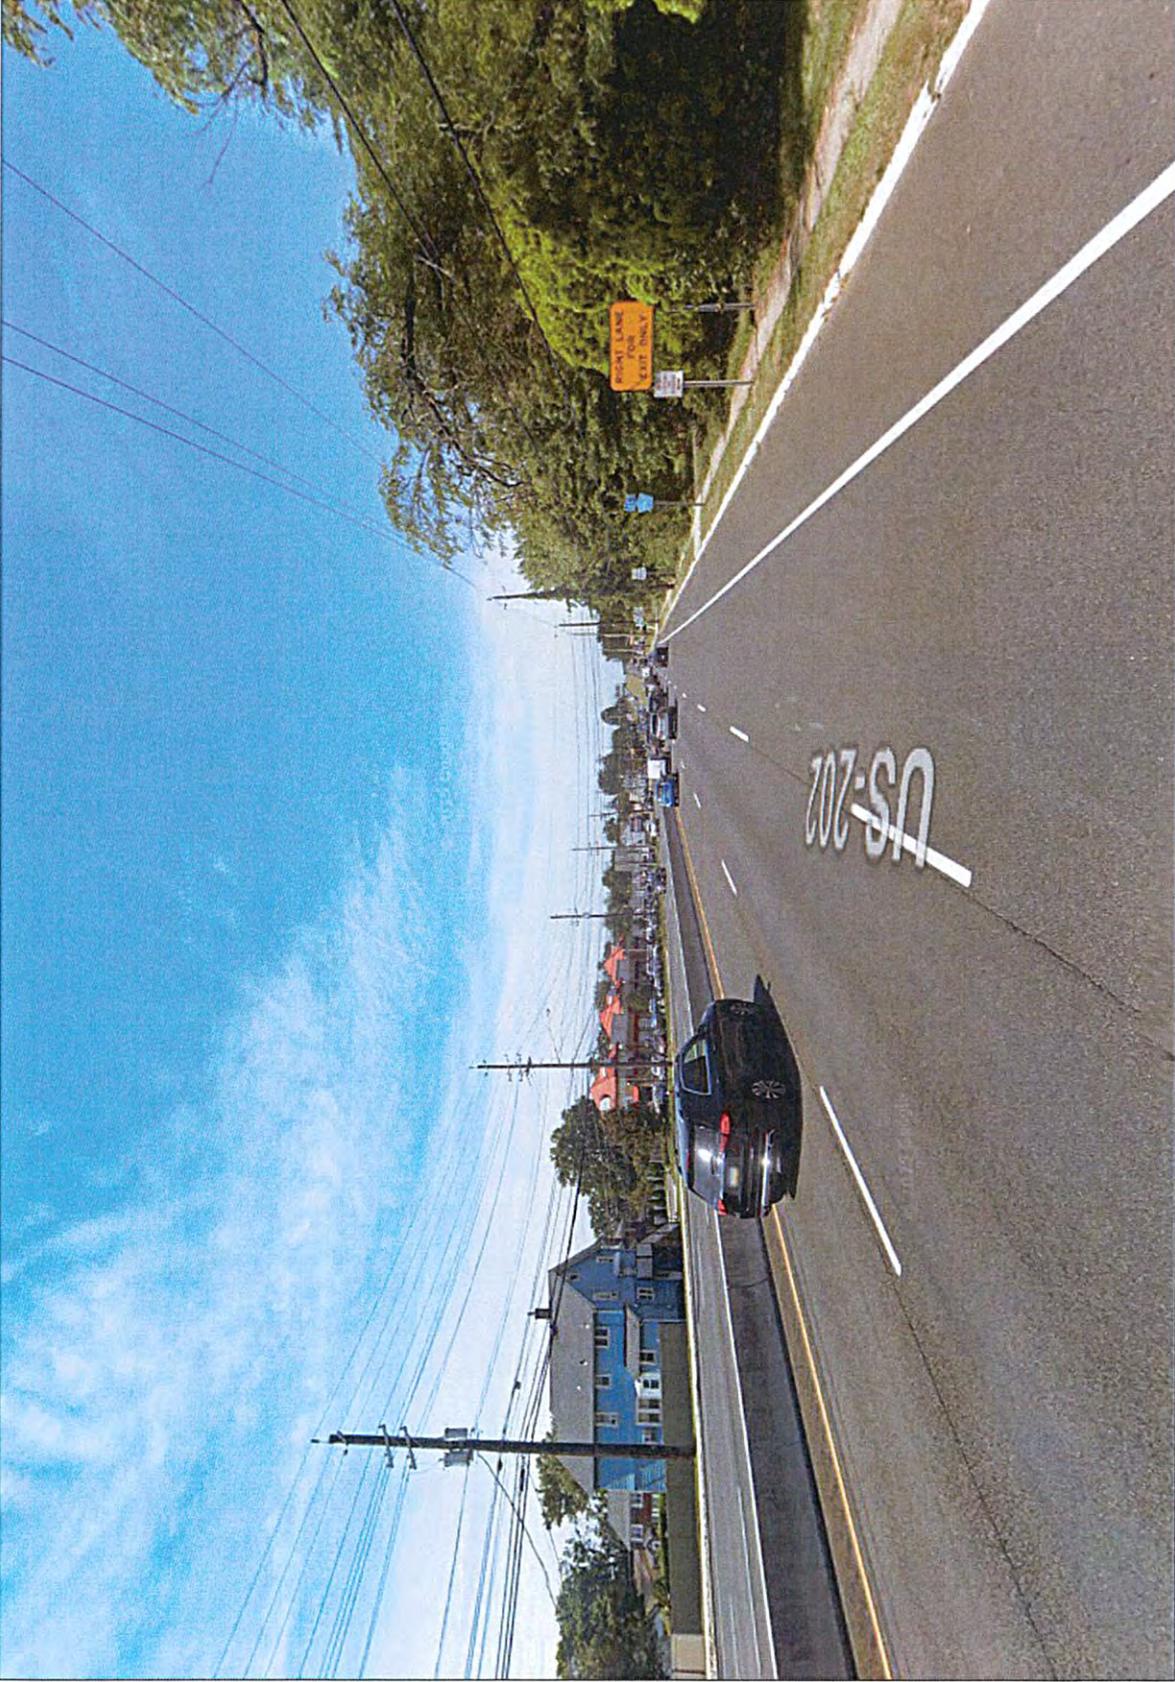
NJSH 202 SB. APPROXIMATELY 600 FEET NORTH OF PROPOSED SIGN
